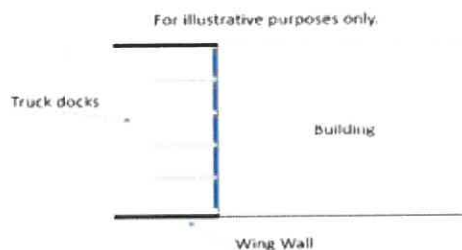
EXHIBIT C – FILE NO. Z0822-0253 - CONCEPT PLAN
